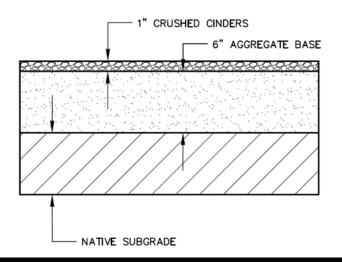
Typical Section Detail of Ryan's Trail Drawing by: Trevor Snipes
